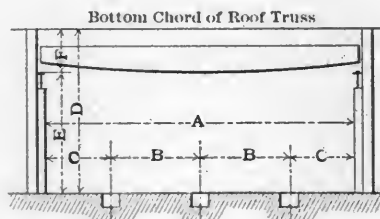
CROSS-SECTION OF LONGITUDINAL ERECTING SHOP.
